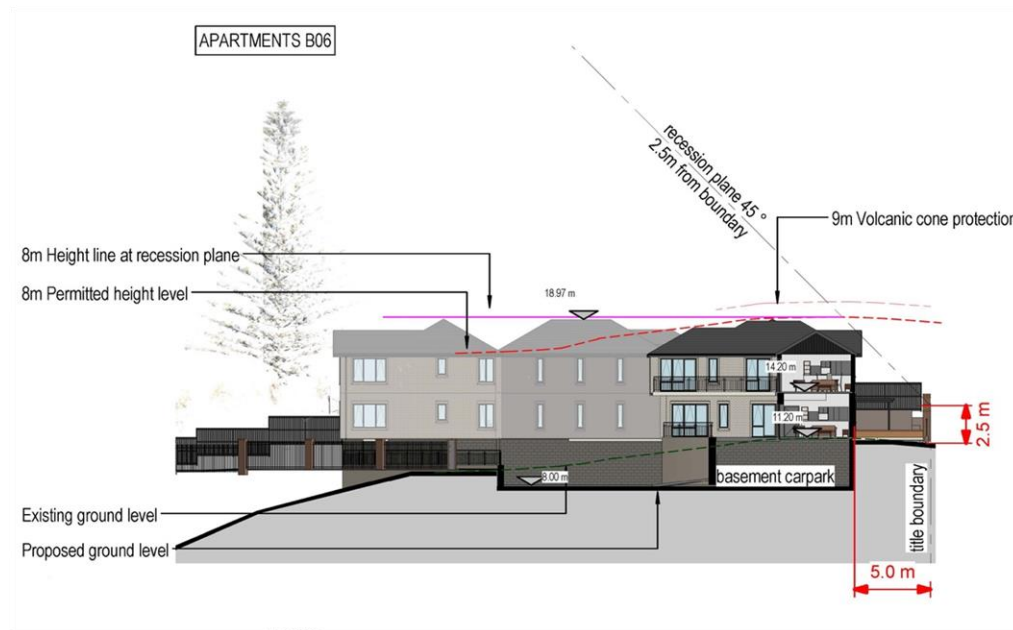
The Lake Road elevation of Building B06 (Ryman Drawing A2-0010 RC10).
